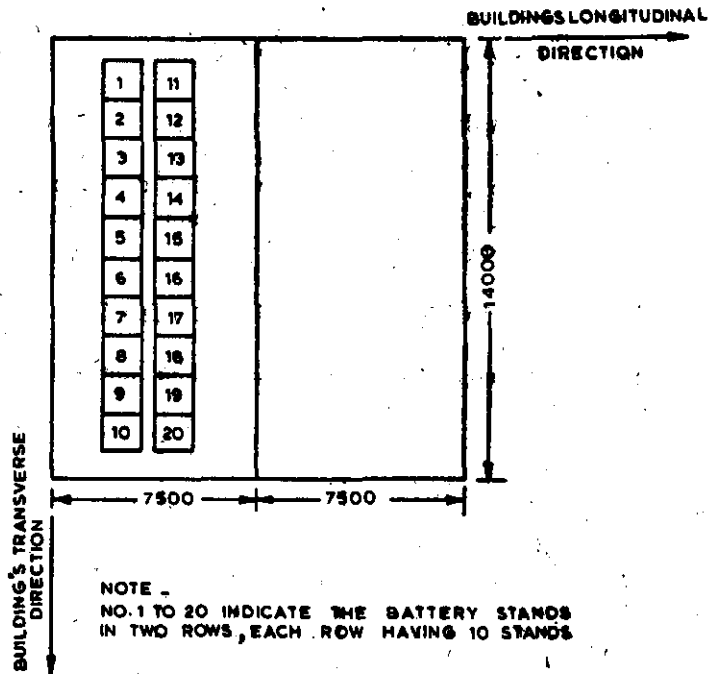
Sketch Plan of the Bays in the T. G. Building Housing the Battery Stands
